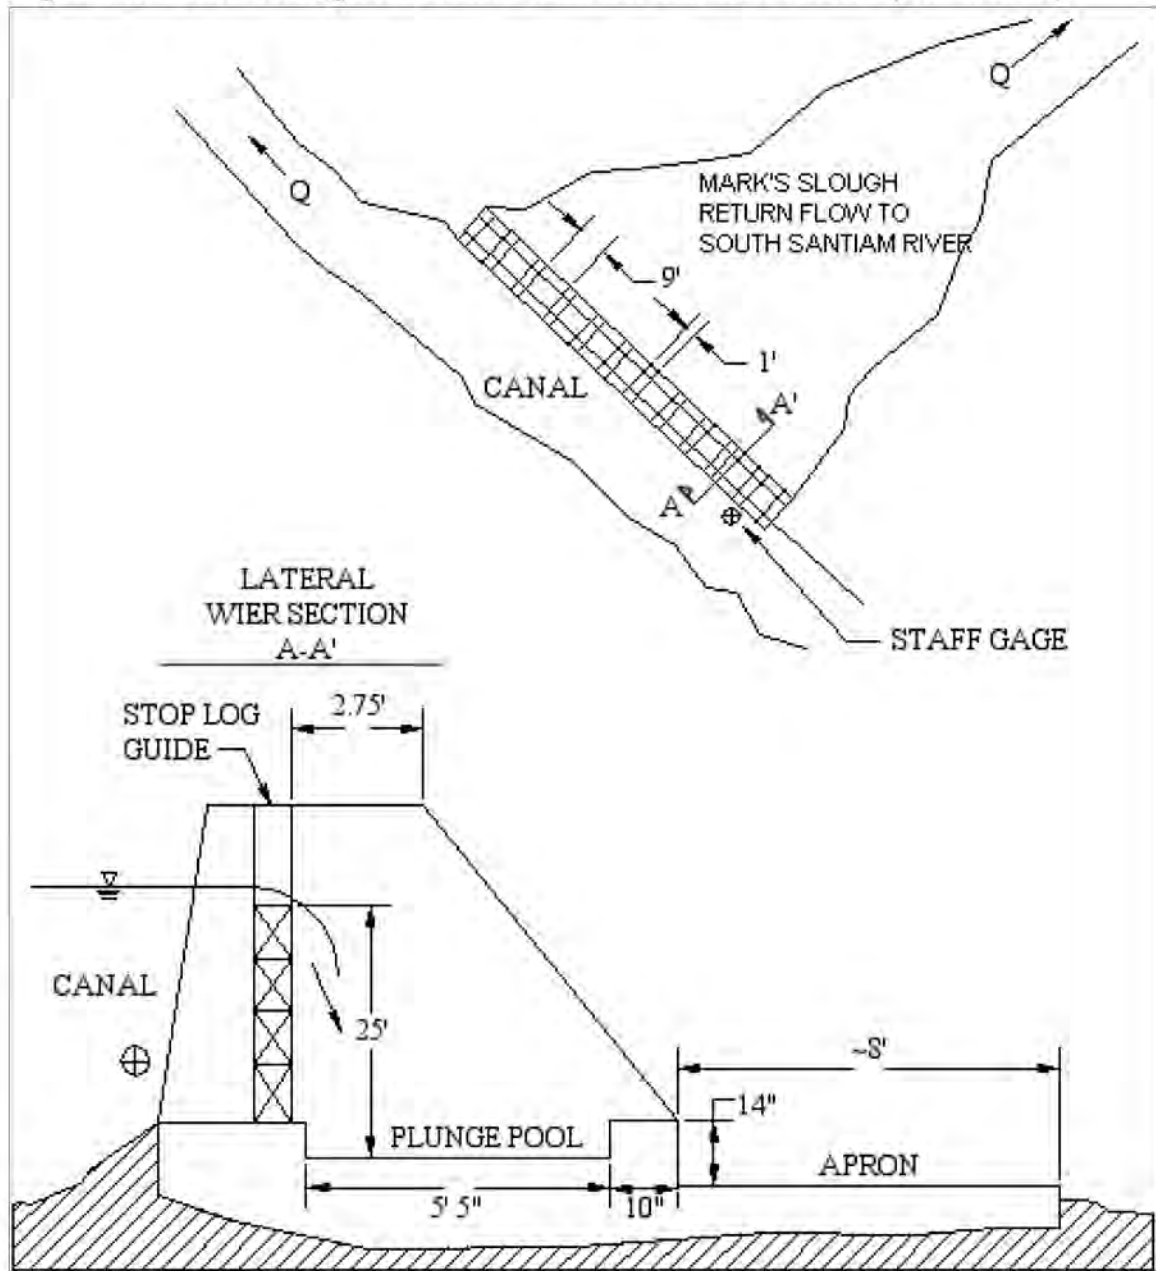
Overflow Weirs at Mark's Slough Diversion.
